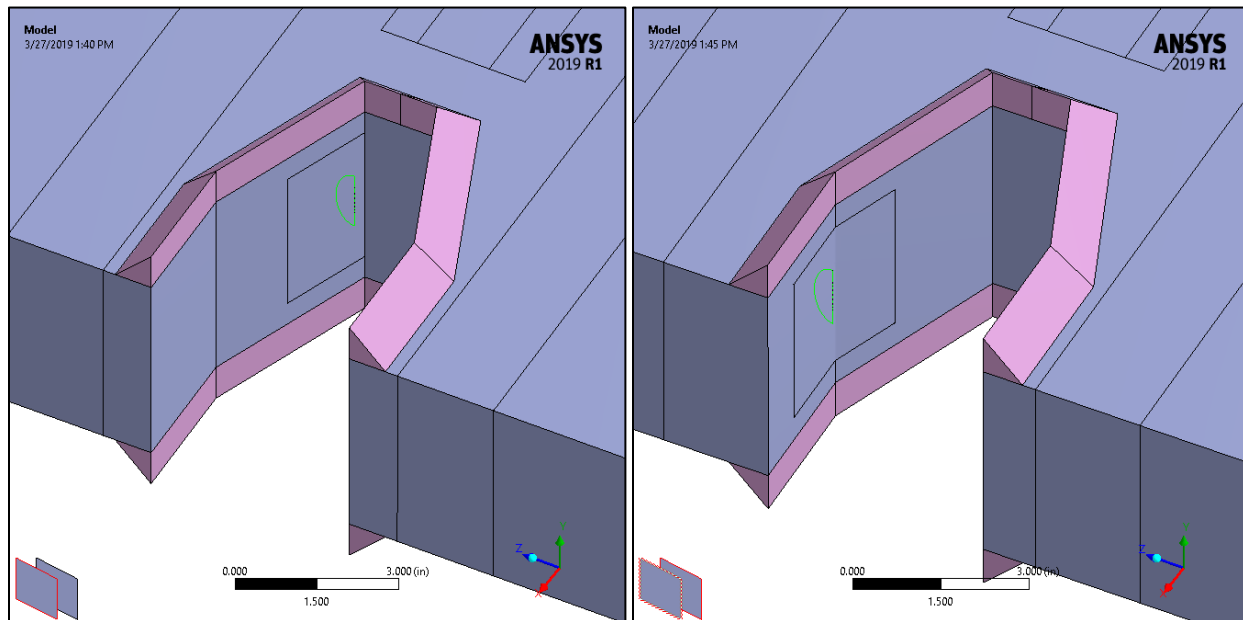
Bottom flange hanger slot end corner crack (left) and transition corner crack (right). Hanger, stiffener, and web plates are hidden from view.
